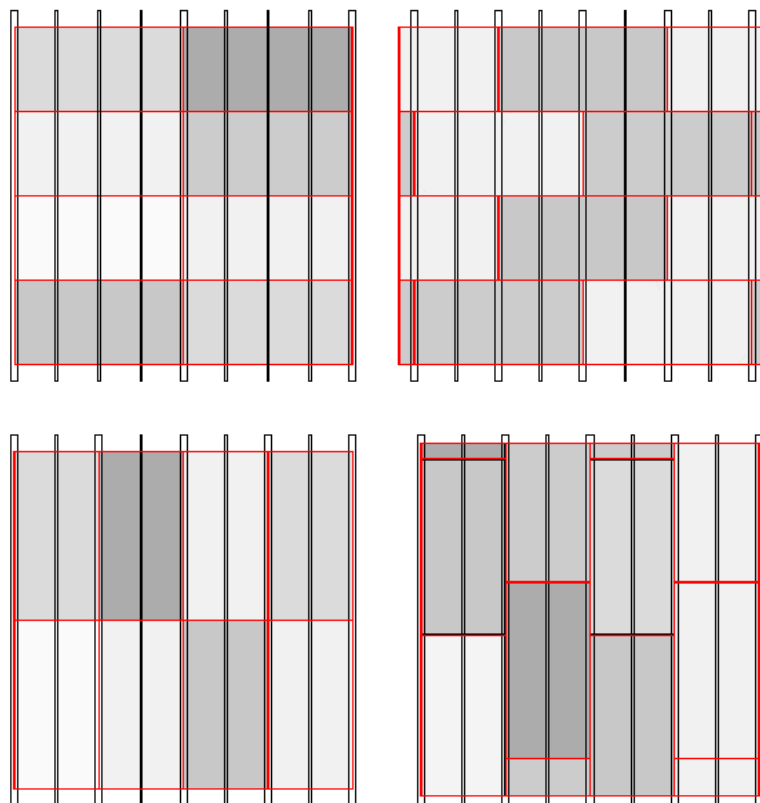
Examples of continuous joint and staggered joint layouts, with panels fitted horizontally and vertically, respectively.
